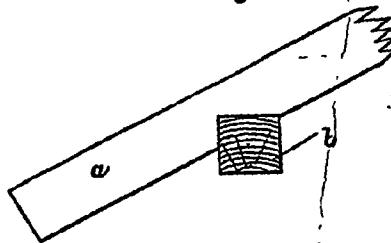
shows a rafter notched on to a wall plate : the rafter a is seen in elevation, the wall plate b in section. Scale $\frac{1}{16}$.
